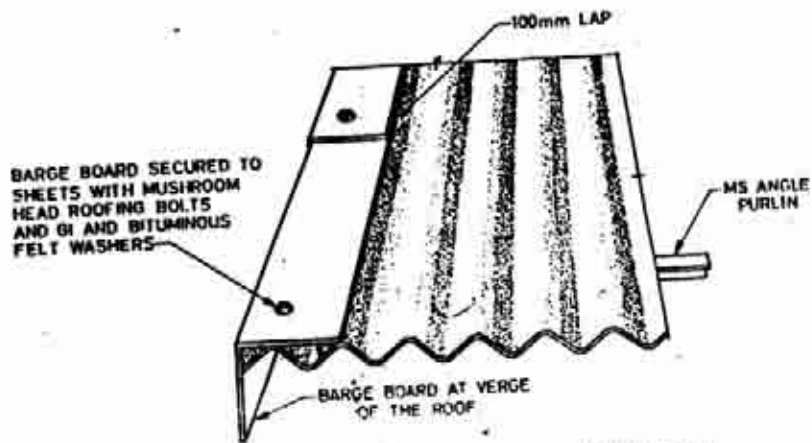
FIG. B TYPICAL DETAILS OF BARGEBOARD ON CORNER PIECE (VIEW FROM EAVES)
